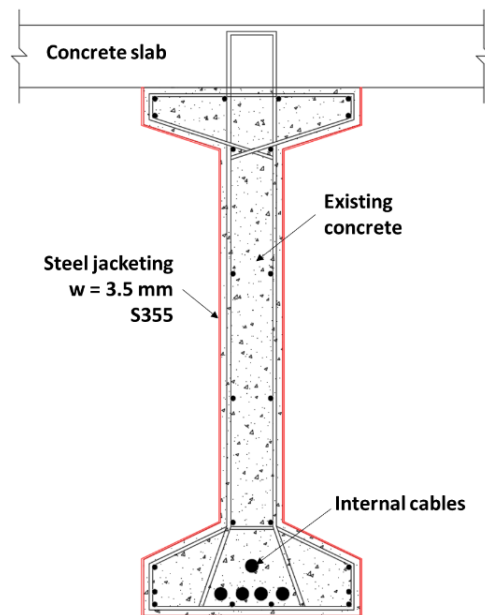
Strengthened configuration of the cross-section of the case-study prestressed reinforced concrete girder through steel jacketing.
